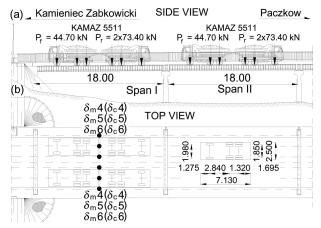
Pre-stressed concrete road bridge and load cases distribution on bridge during field test: (a) side view from headwater, (b) top view – technical parameters of truck type KAMAZ 5511.
